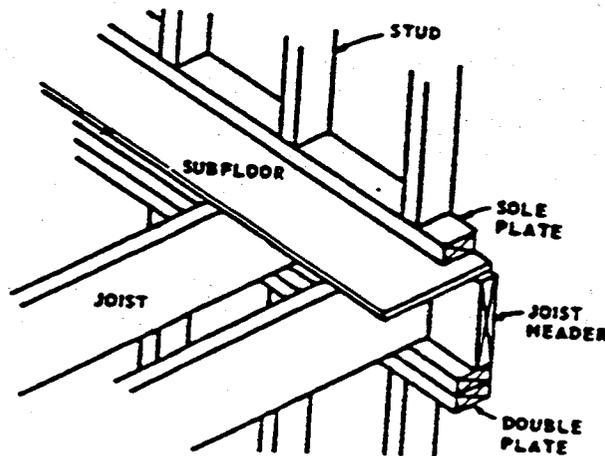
Method of framing upper-floor joists and studs in platform framing.
